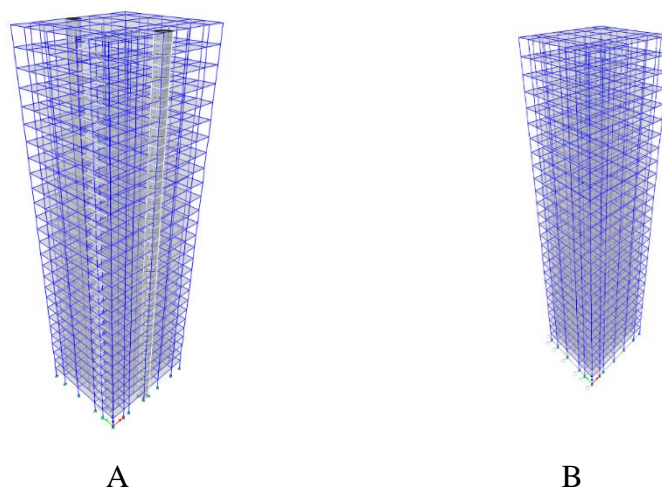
3: Regular Frame with a shear wall around the lift and same without a shear wall, 6*5 bays of 27 story 3D
